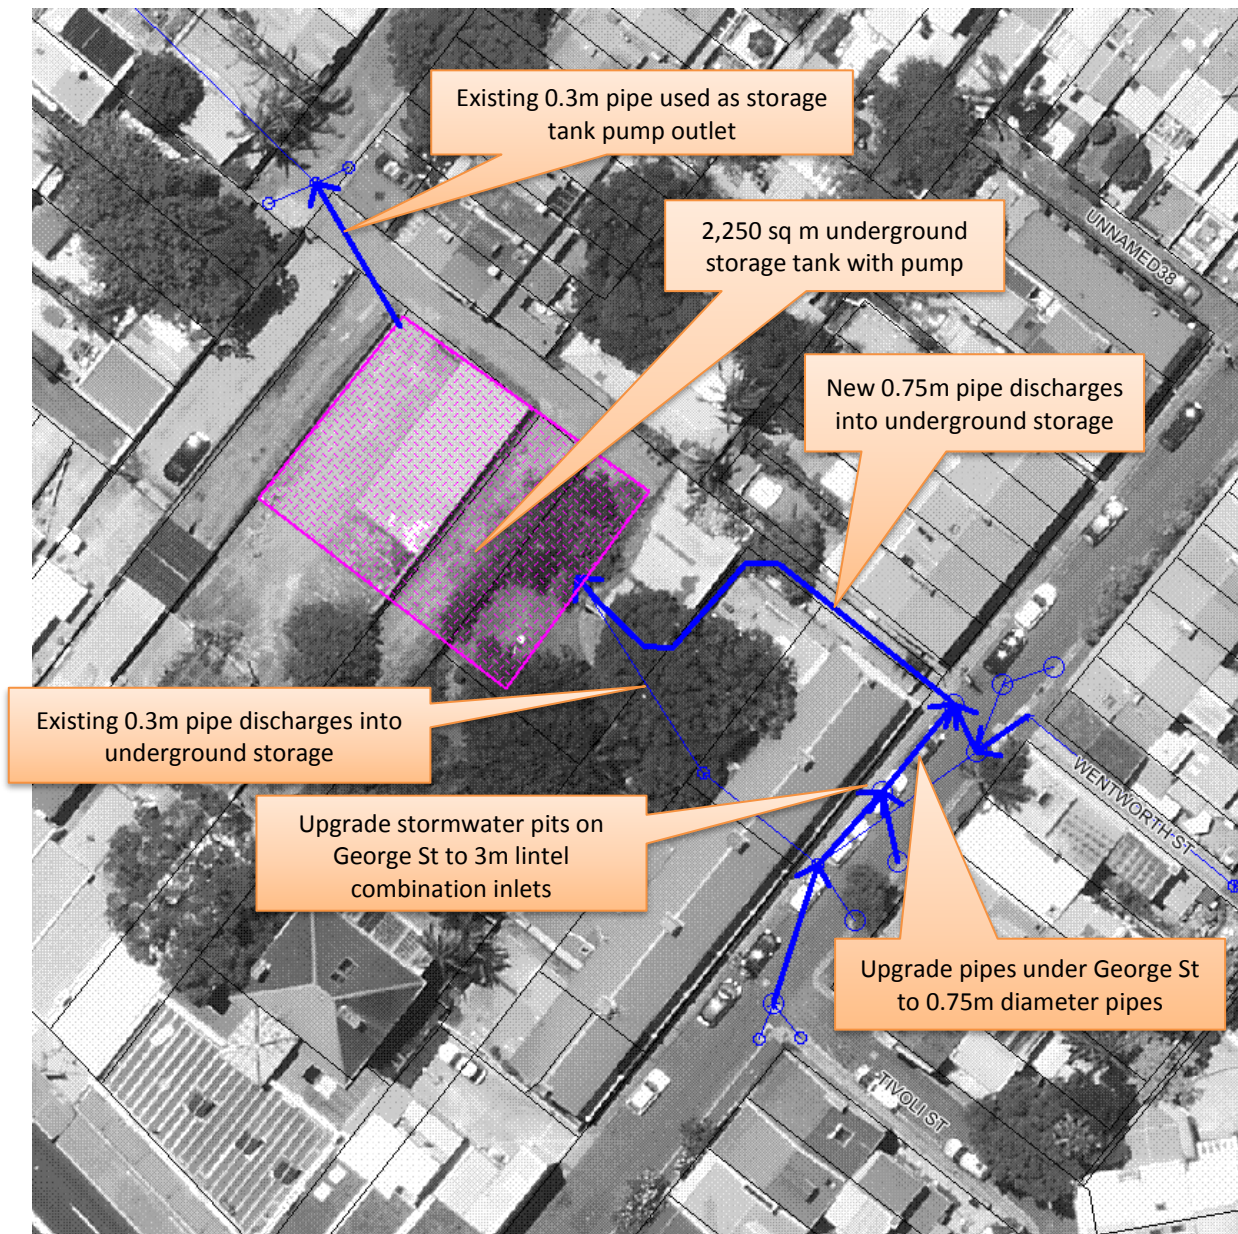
Design concept for Elizabeth Place Below Ground Detention
